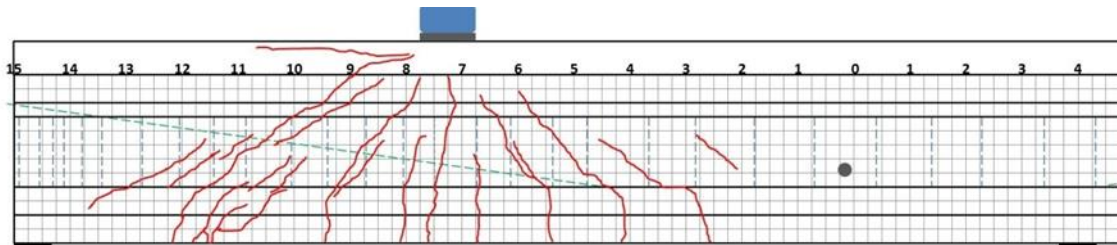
Shear test A1 cracking pattern (3 in. grid shown) (from Cranor 2015)
